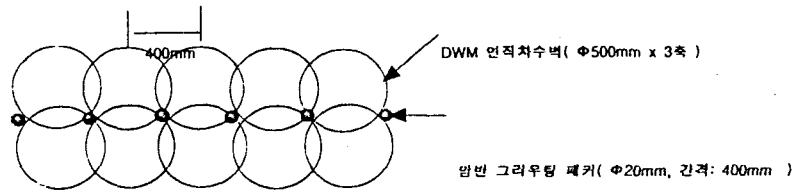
Detailed Layout of Deep Soil Mixing Columns
